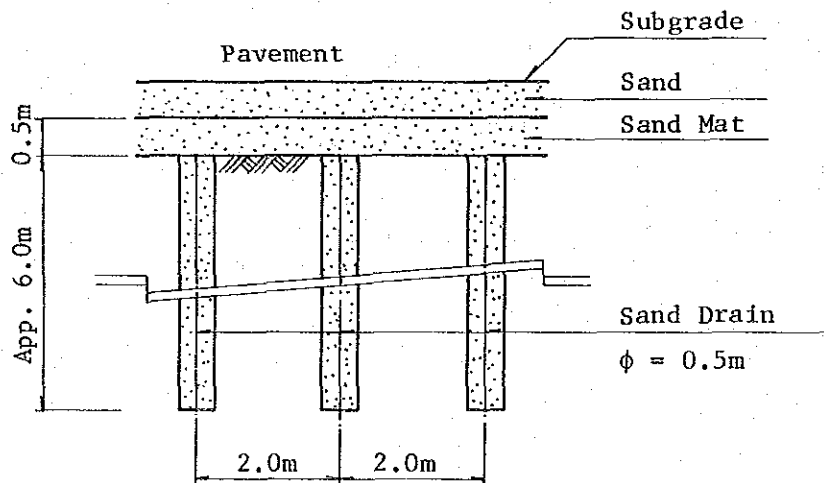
Typical Corss-Section of Sand Drain
